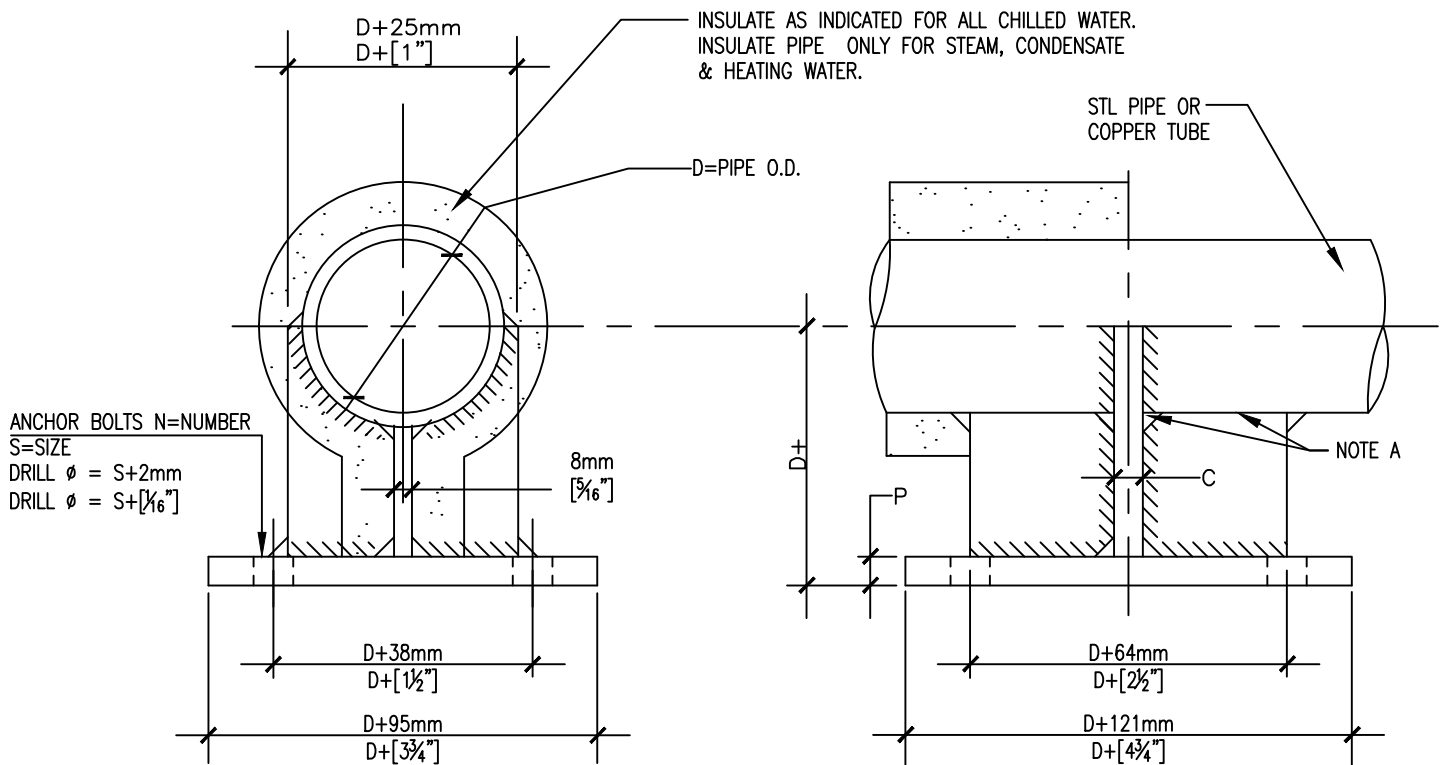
DETAIL TITLE: DETAIL FOR SUPPORTING PIPE ON ROOF
